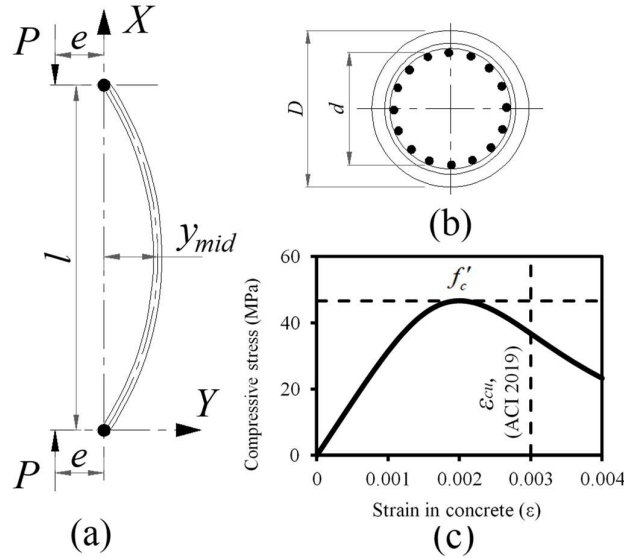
(a) Pin-ended column bent in a single curvature, (b) Column cross-section, (c) Concrete stress–strain model.
